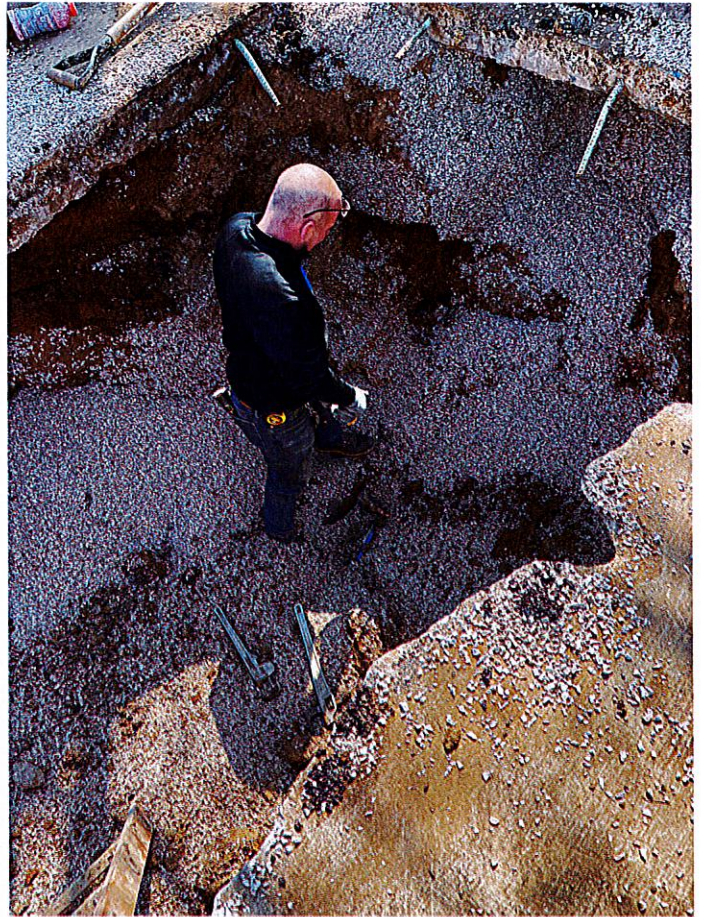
Heiden Plumbing working on filling the hole with gravel after fixing city's collapsed lateral sewer drain pipe; taken on March 15, 2022 at 11:30 a.m.
